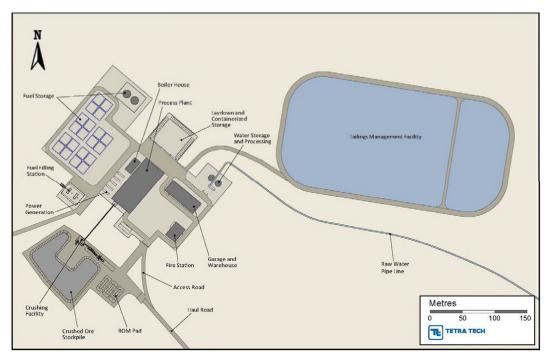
Process Plant Facility Layout (Tetra Tech 2017)
